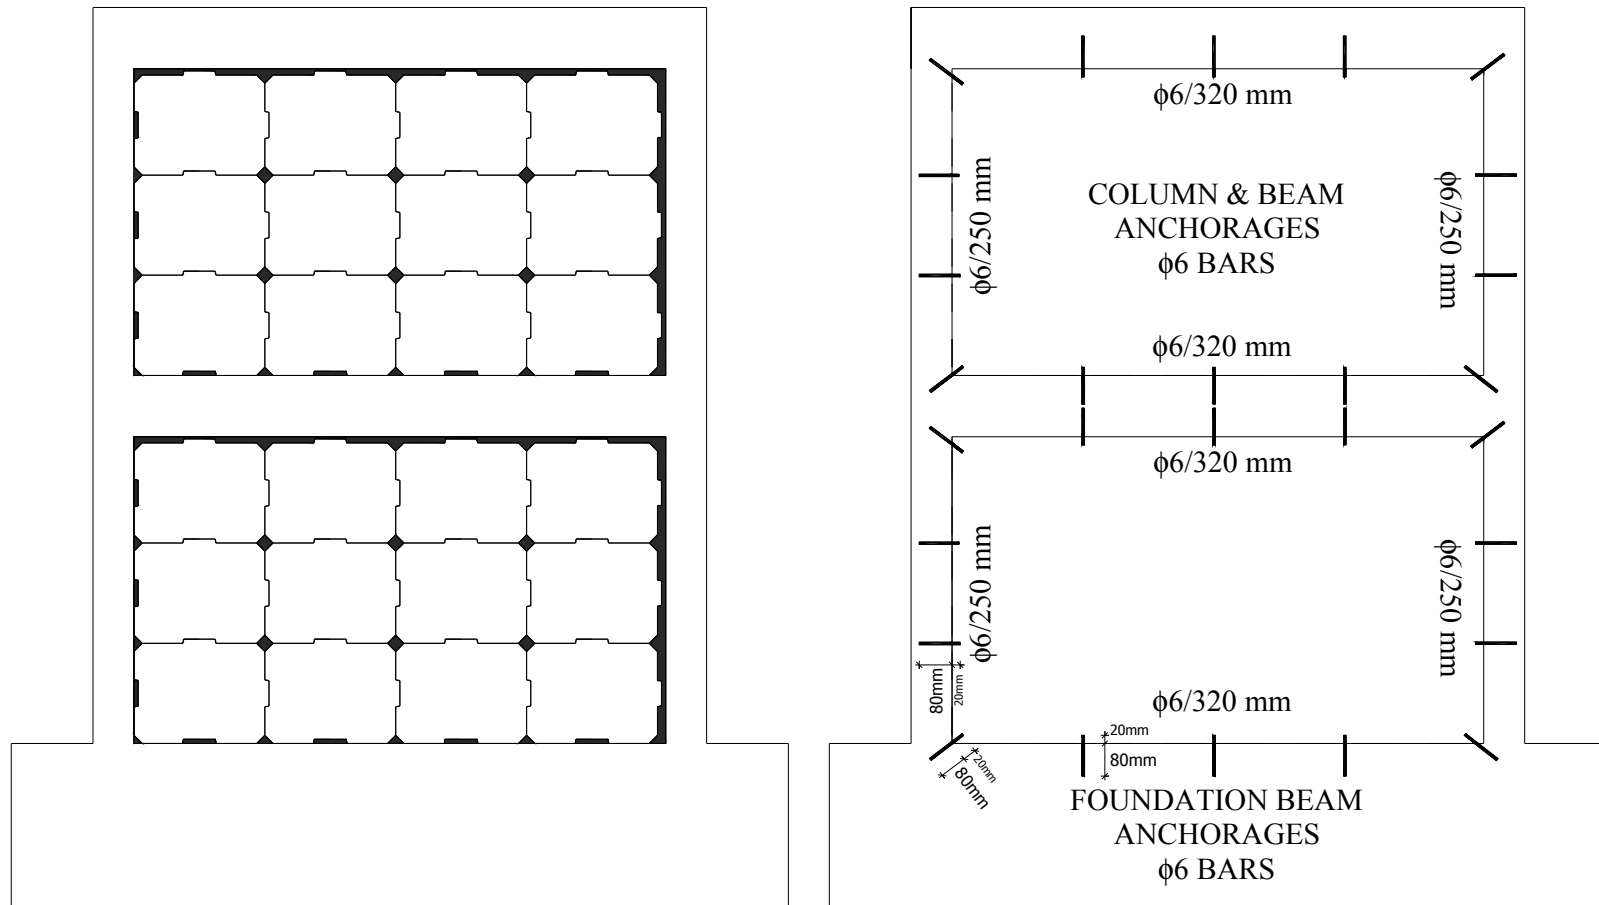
Panel arrangement and configuration of the dowels for Specimen CIA4
